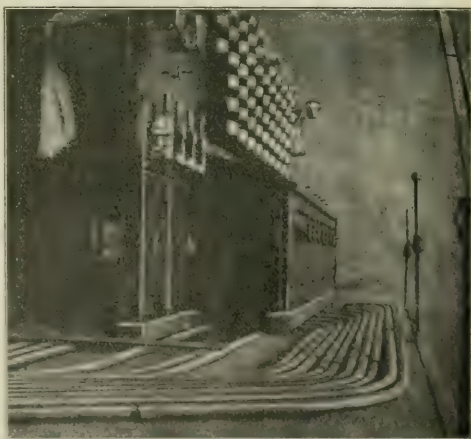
VIEW OF SWITCHBOARD AT POWER HOUSE, SHOWING CONDUITS.
